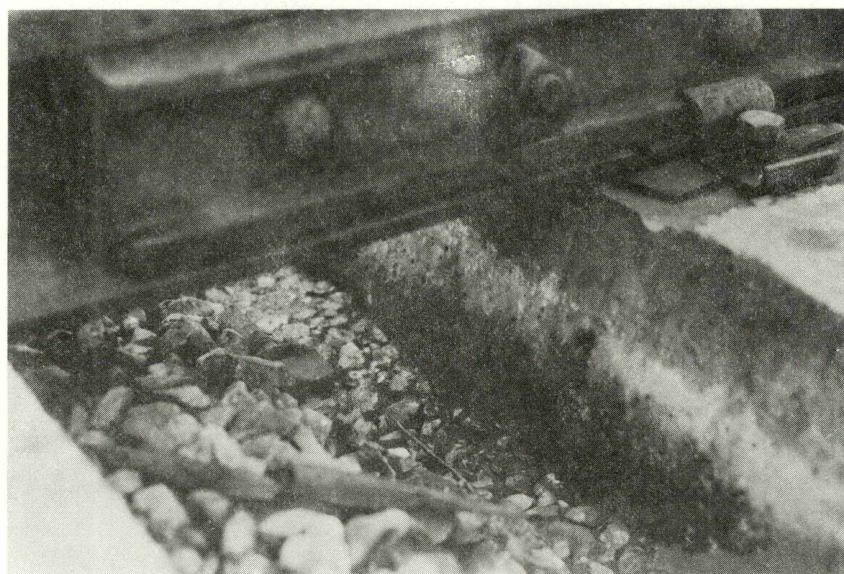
Tie shifted by tie spacing machine to show well tamped ballast under rail seat. No deterioration. (2)
